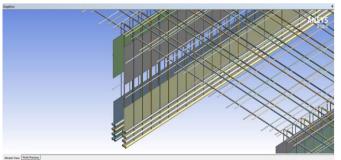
Layout of bridge with mild steel strip (3.15mm) (Full depth of web)
